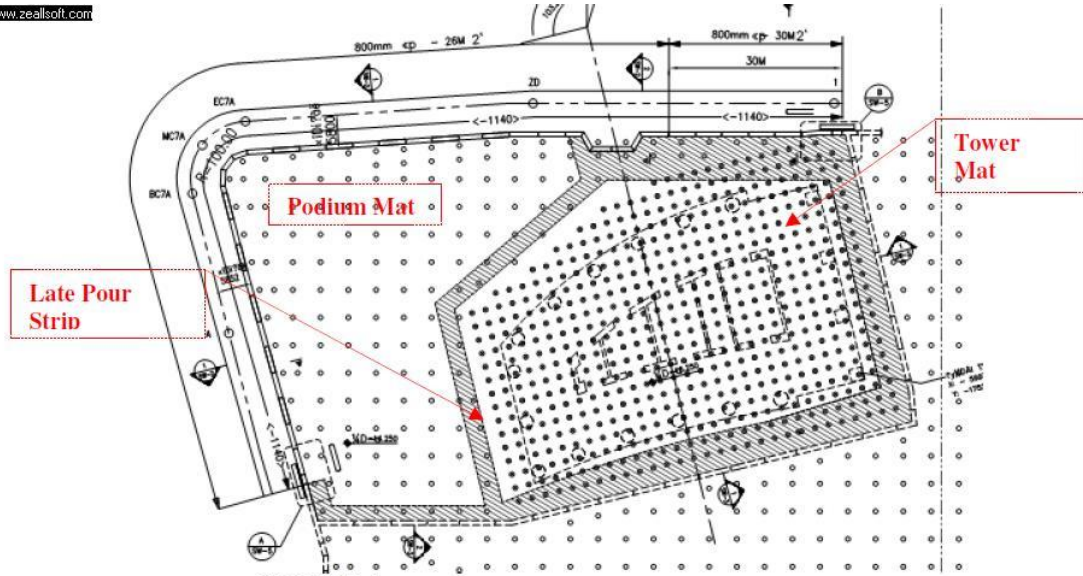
PILE FOUNDATION AND PILE LAYOUT
